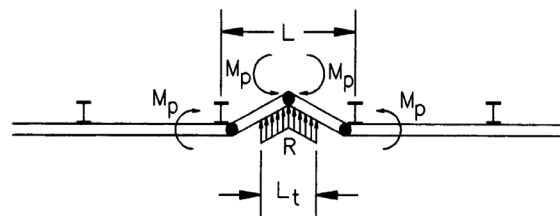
Yield Line Analysis of Concrete Parapet Walls for Impact near End of Wall Segment
